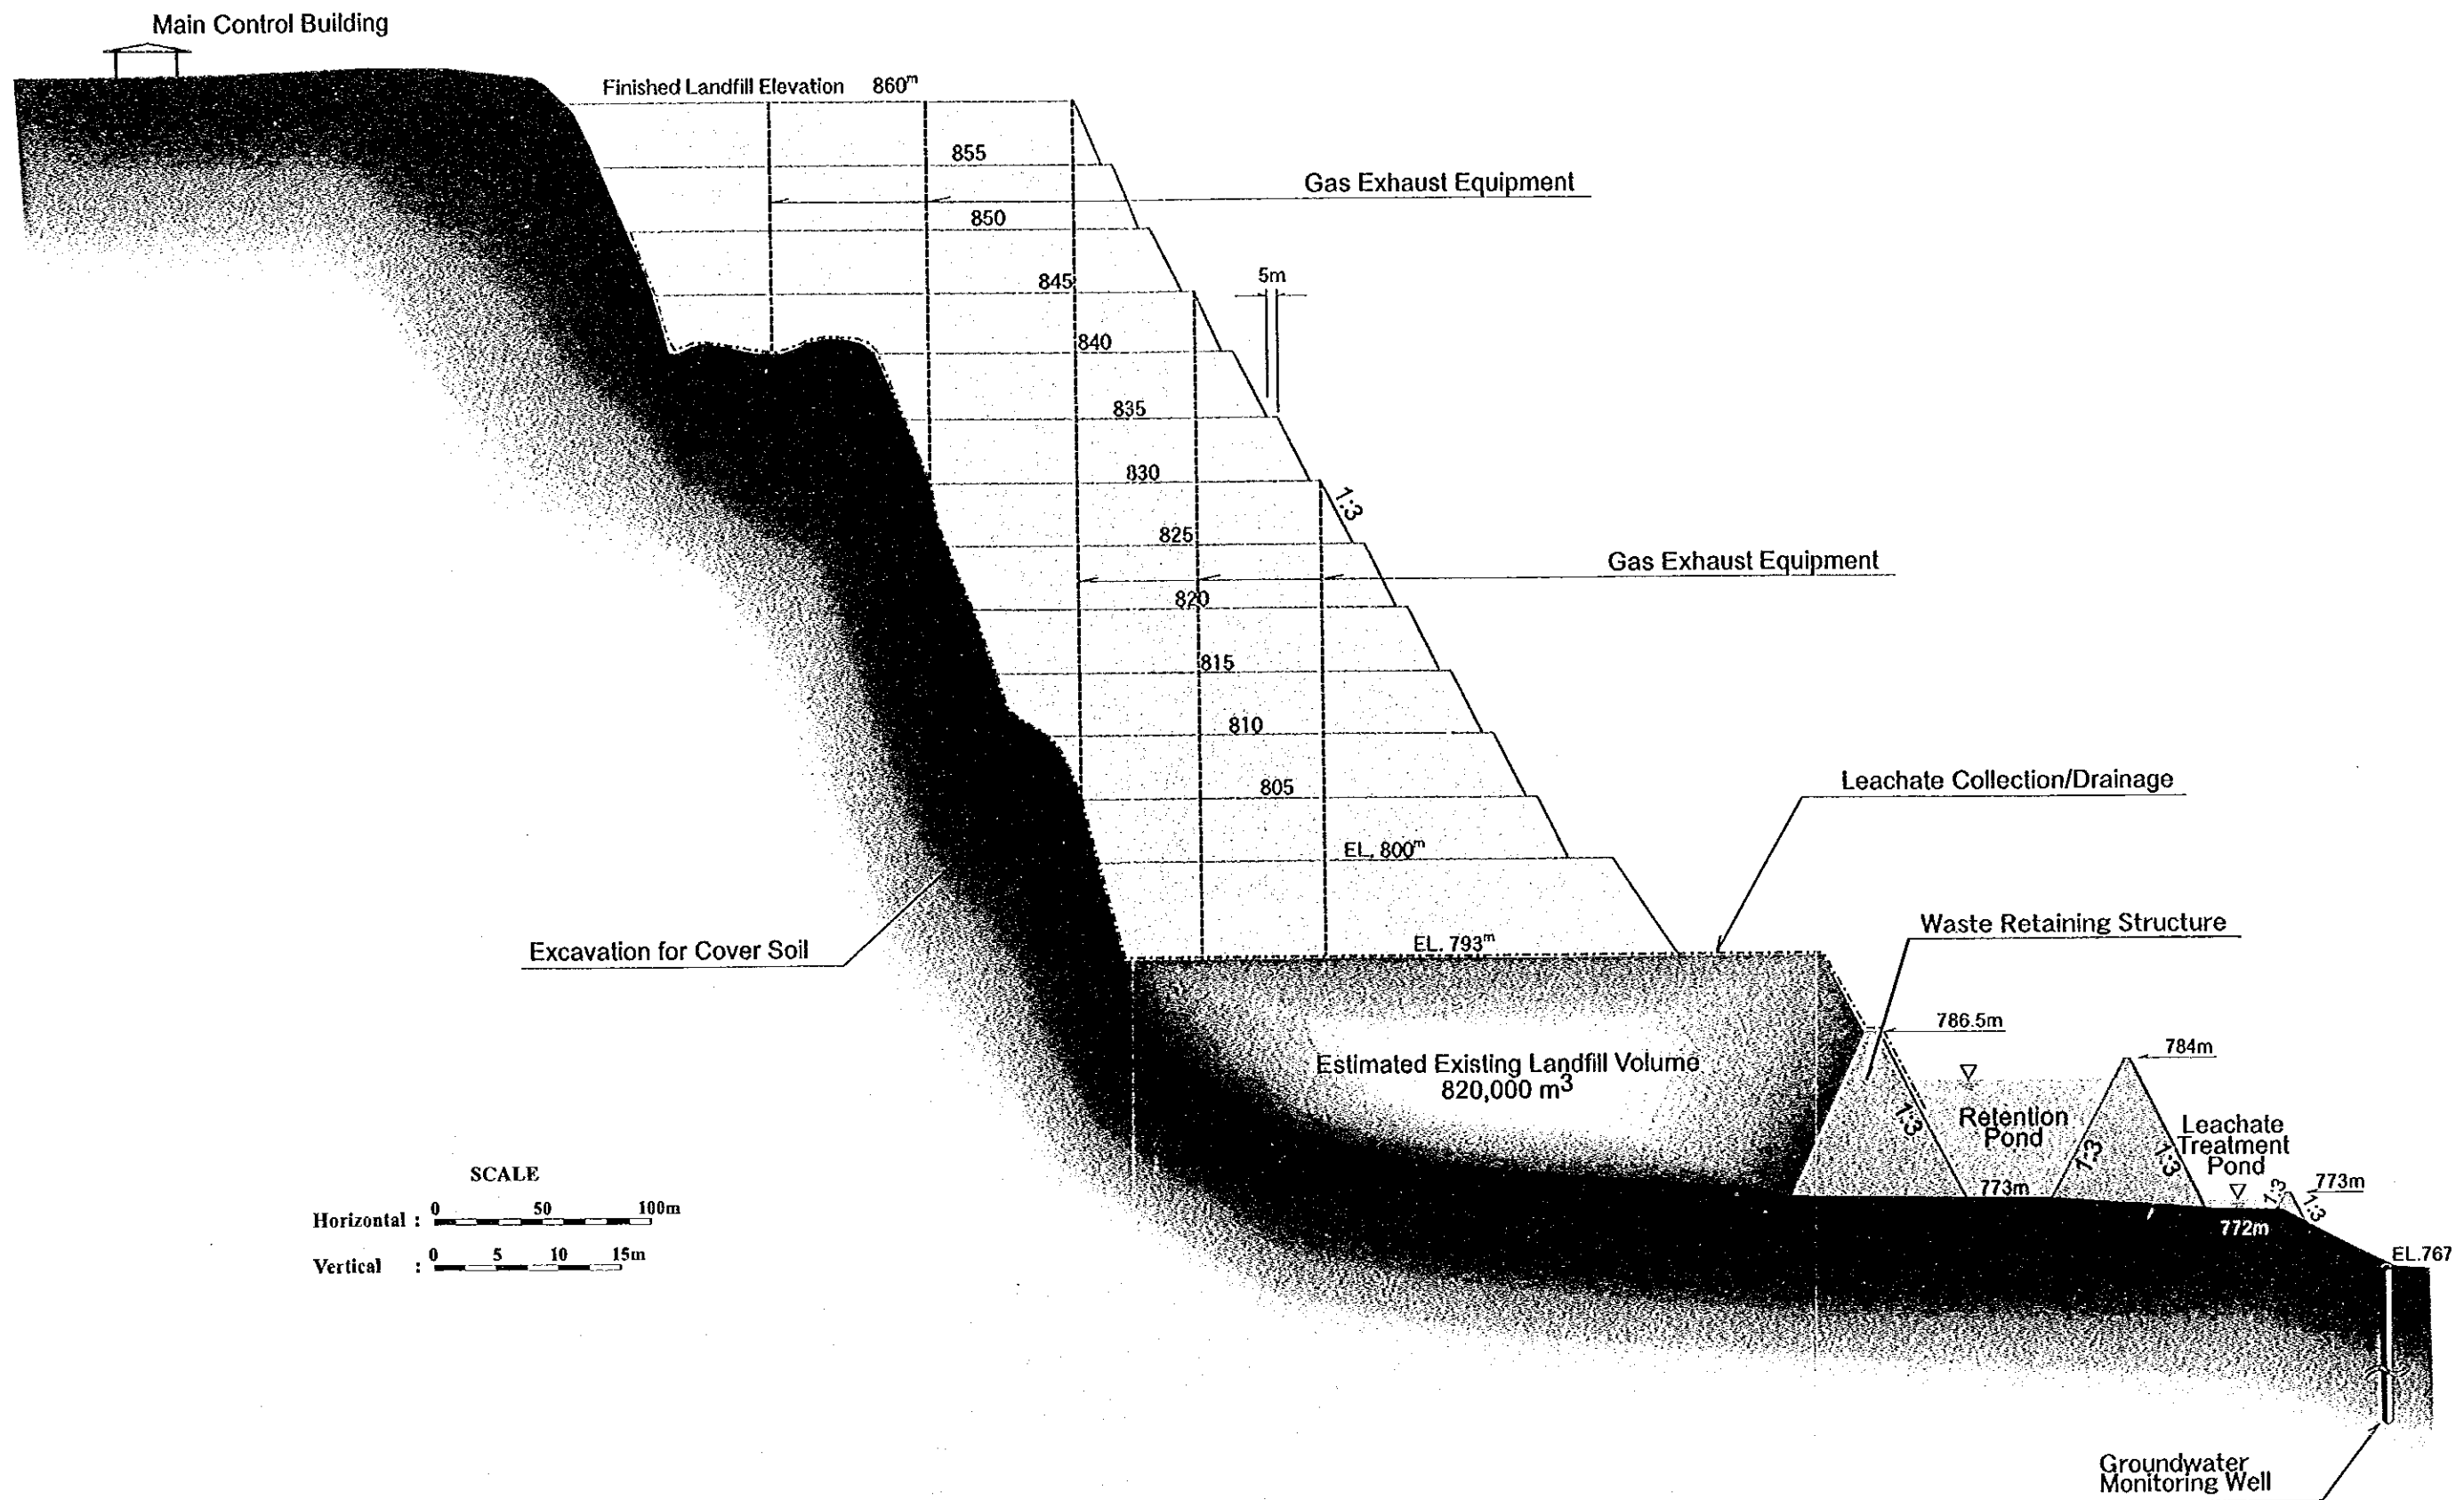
Longitudinal Section of Karasai Disposal Site Improvement Works (Section A-A)
